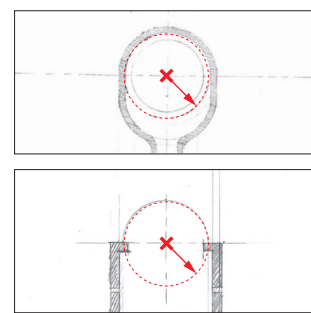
(Above) House Plan. (Below) Section. Red line indicates the radius borrowed from the plan, informing its section.
